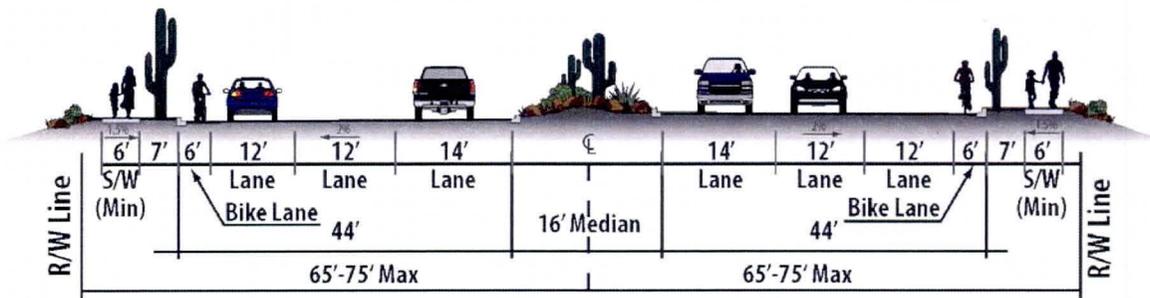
Ultimate Roadway Cross Section – Southern Avenue to Germann Road
